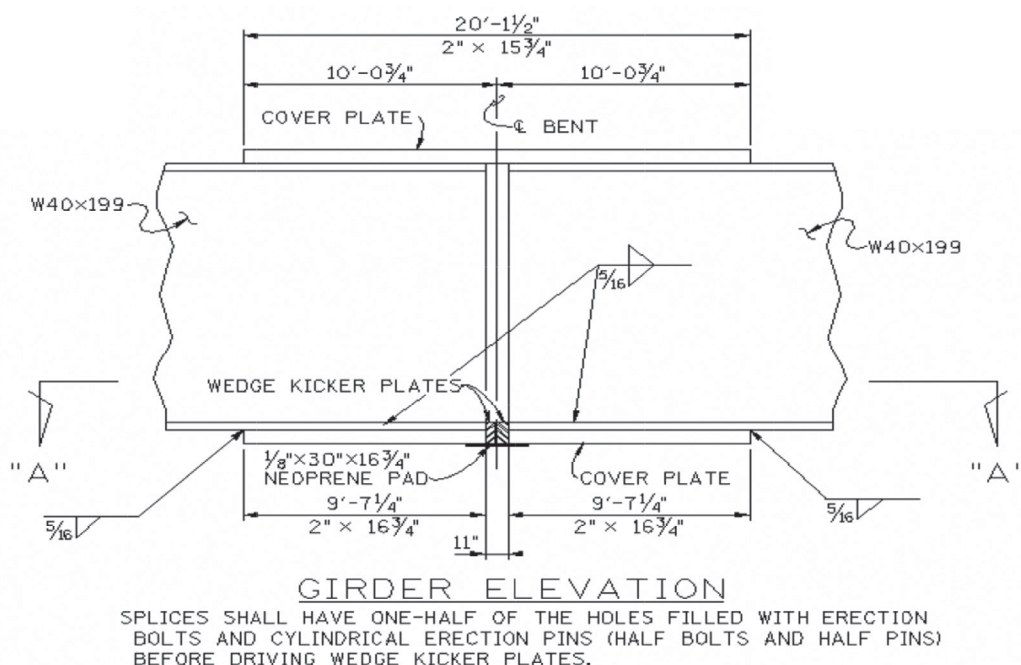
Second detail for an SDCL steel bridge system, used for the DuPont Access Road Bridge in New Johnsonville, Tennessee.
